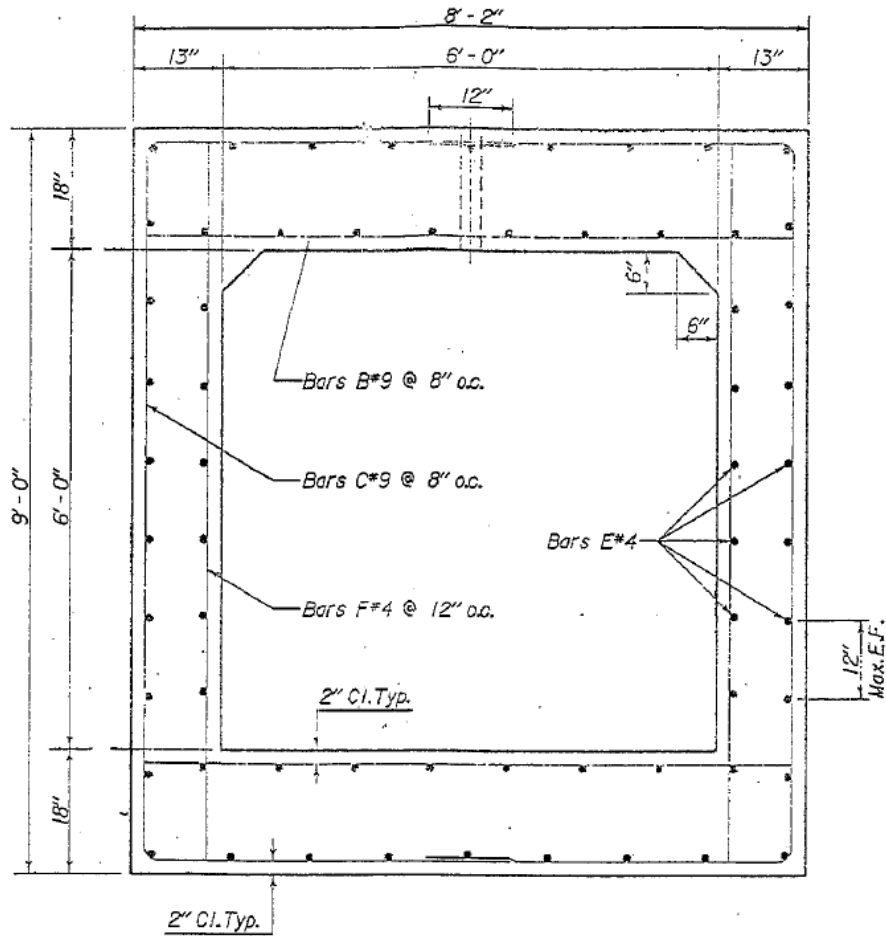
AEB Culvert at 257+69 Cross-Section (ALDOT 2001)
